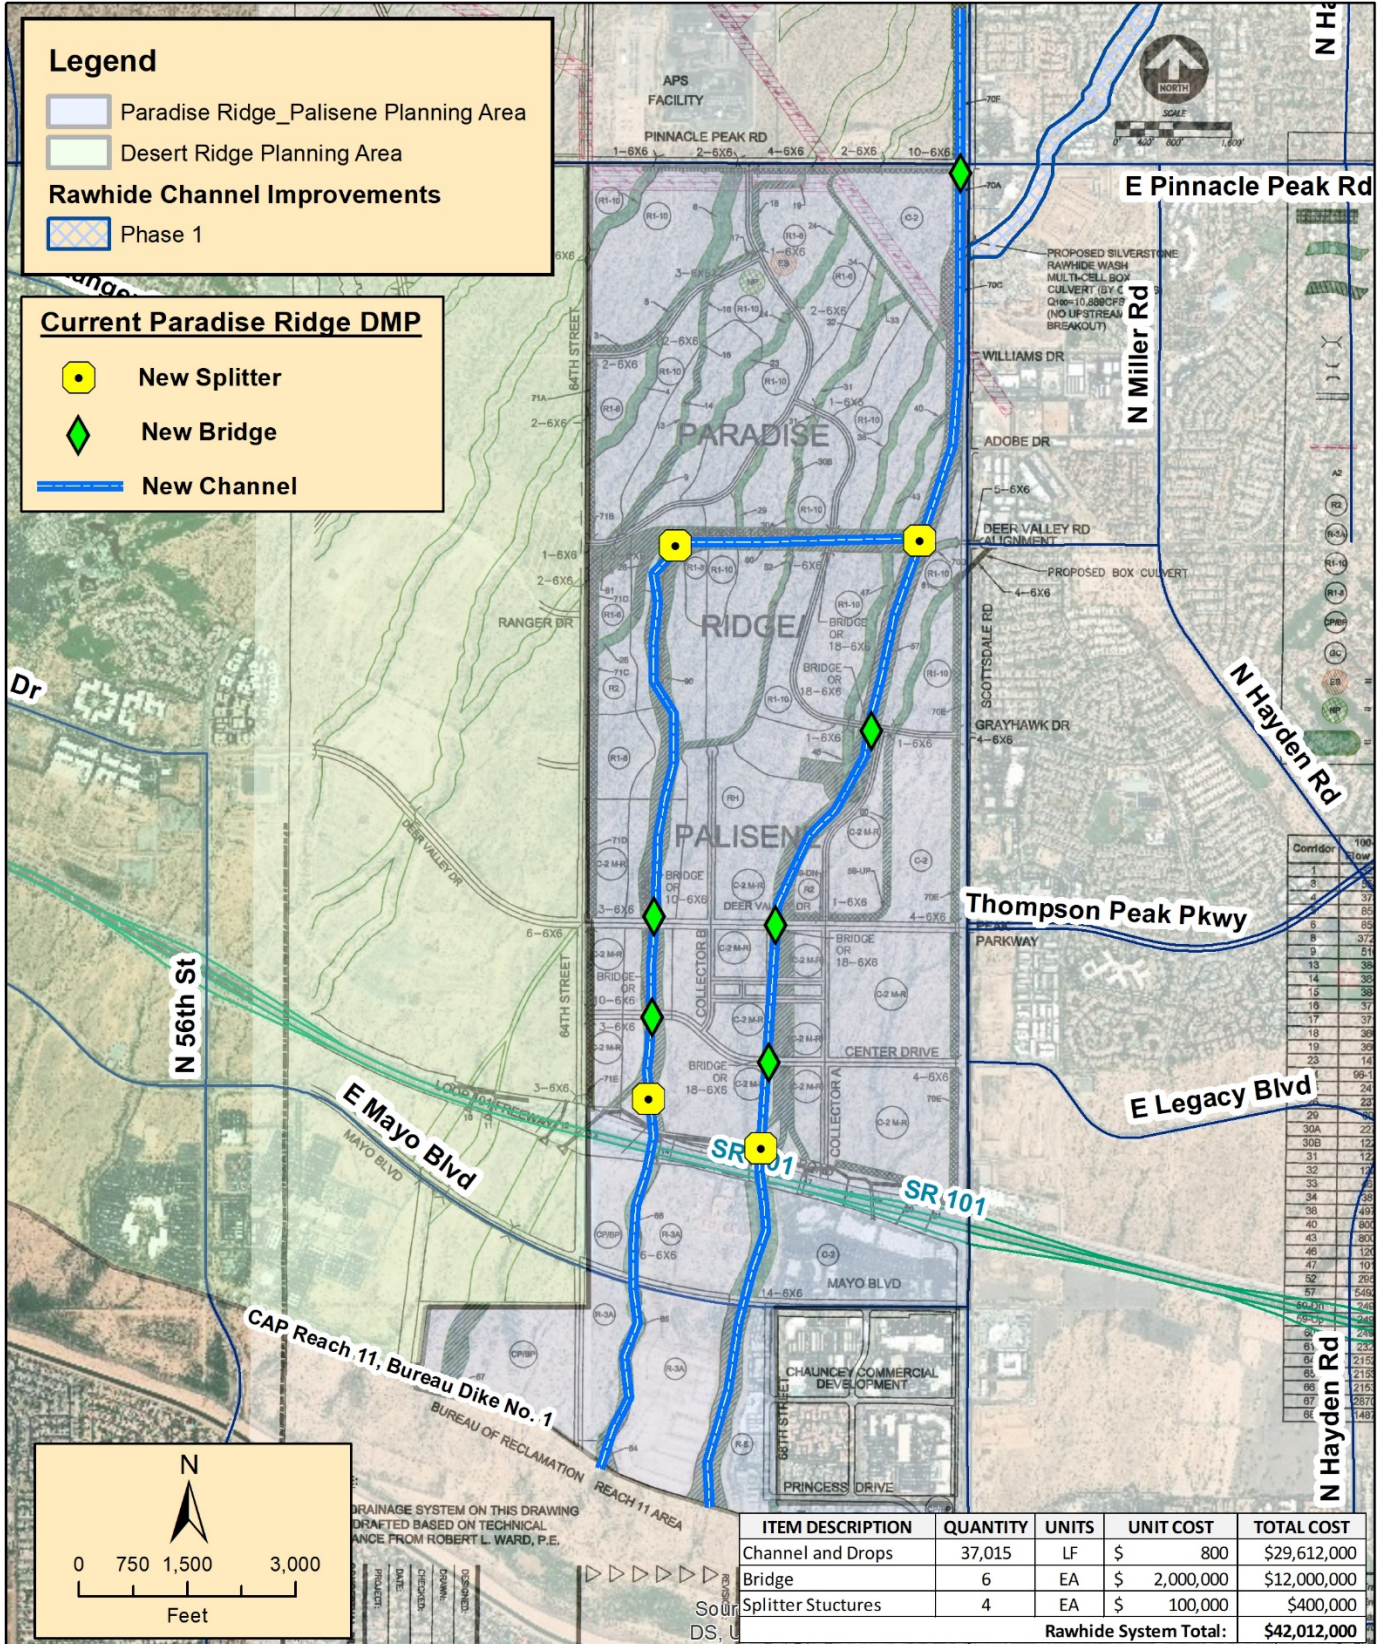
Current Paradise Ridge-Palisene drainage master plan elements
